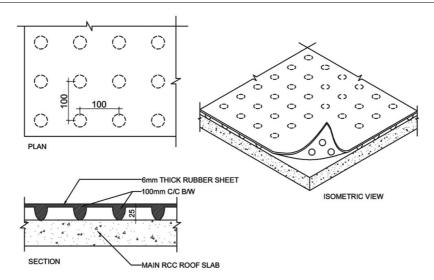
Details of proposed mat for placement over roof for heat insulation.
